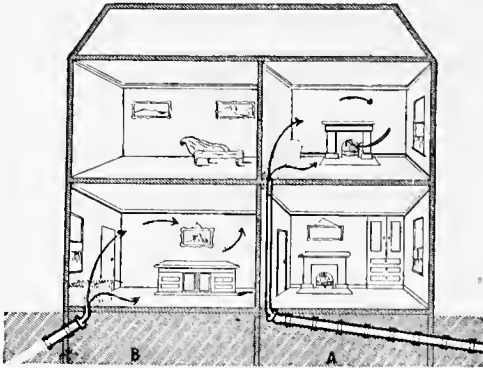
"A" Bath waste pipe cut off and left open to the drain,
